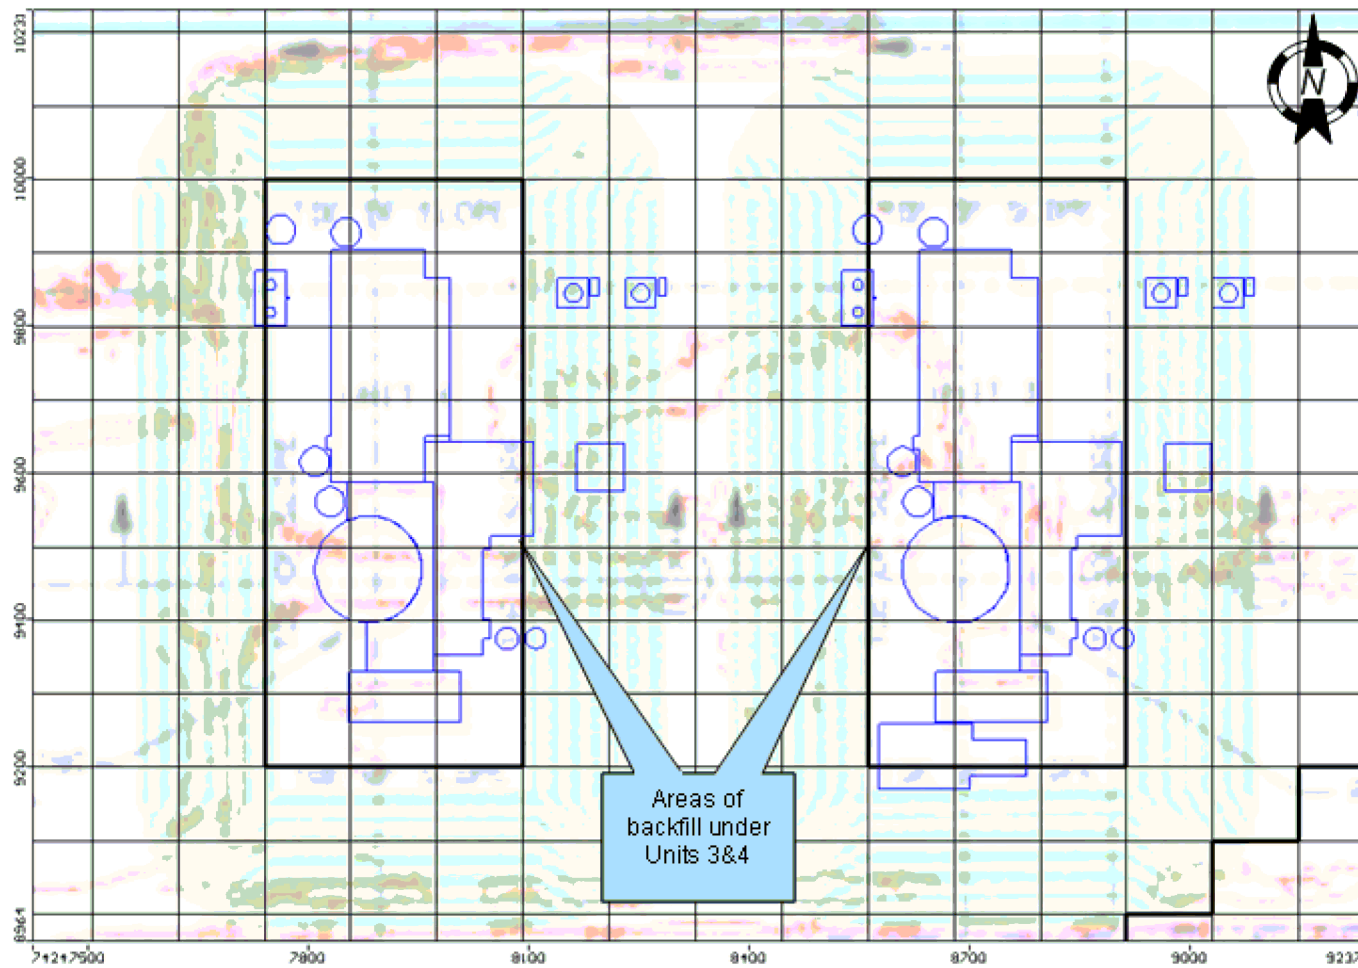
Excavation Plan Overlaid onto Model Grid to Show Areas of Backfill Around Units 3 & 4
